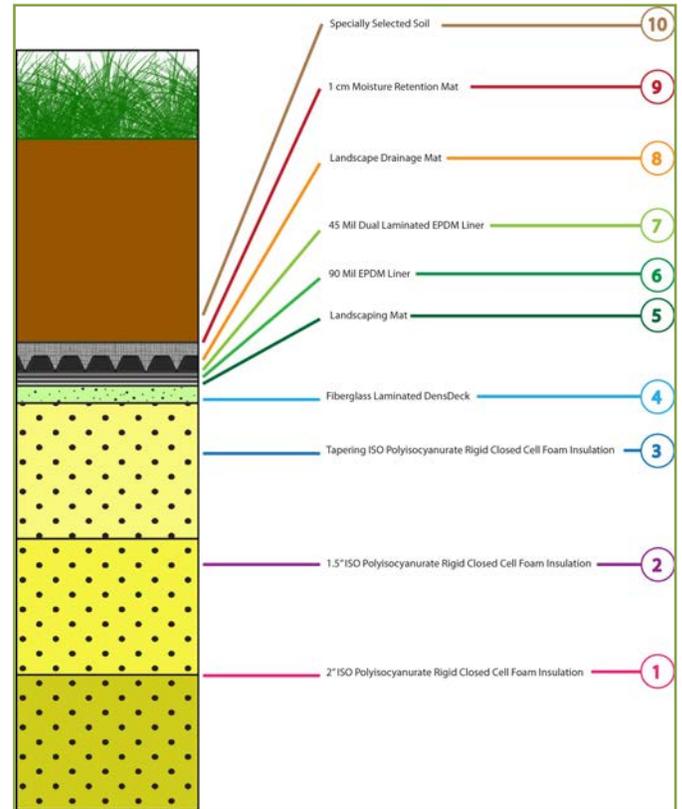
Pearl Hall Living Roof Section. Materials as listed from 1-10:
